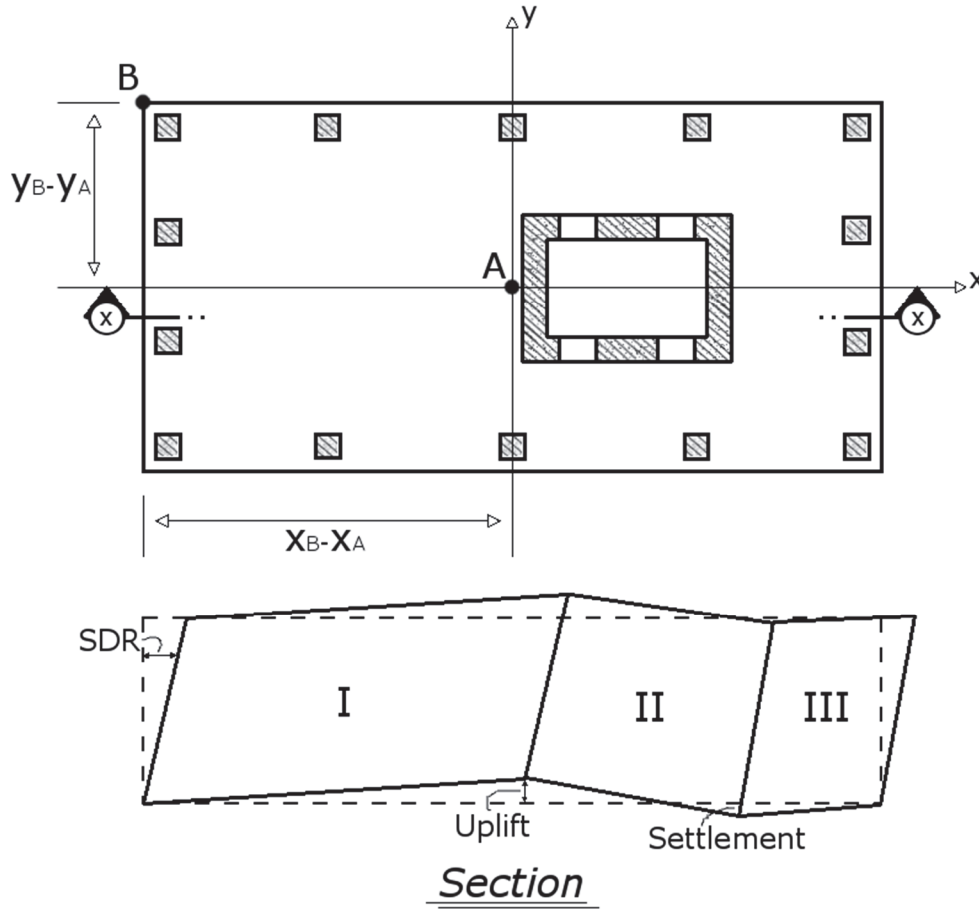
Building floor plan and section to illustrate calculation of building drift and amplification of racking drift due to vertical floor deflections.
